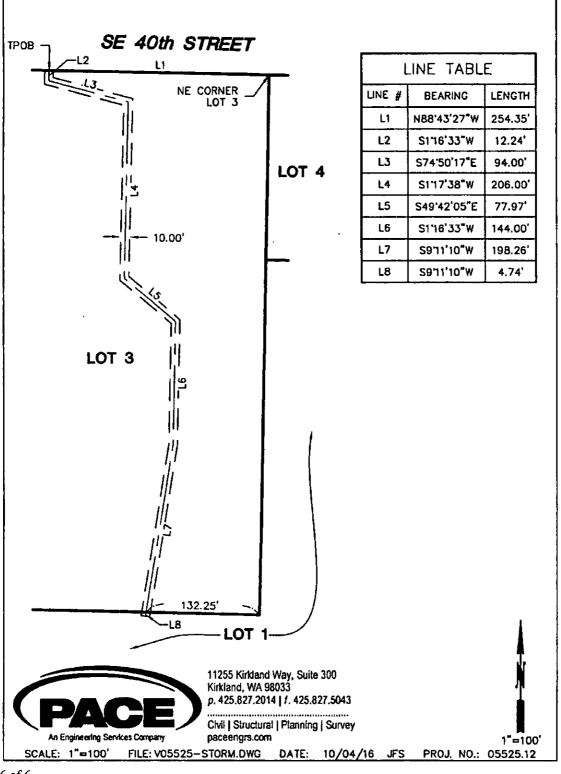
EXHIBIT B EASEMENT AREA EXHIBIT (DRAWING)
